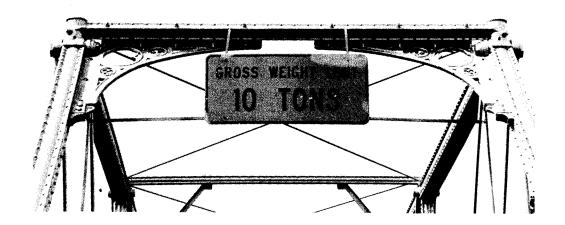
A detail of the portal bracing in Figure 2 showing the patented Phoenix columns and decorative strut bracing.
